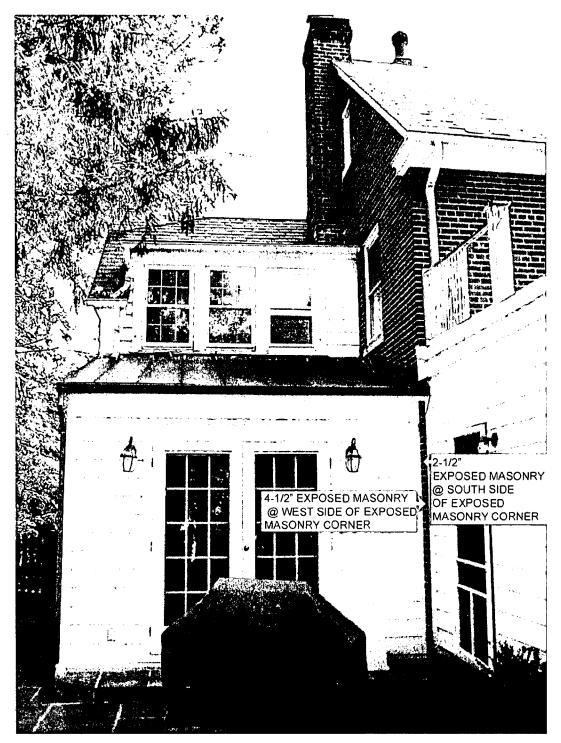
PHOTO - EXISTING SOUTHWEST CORNER OF HOUSE MASSING (MASONRY PORTION)
